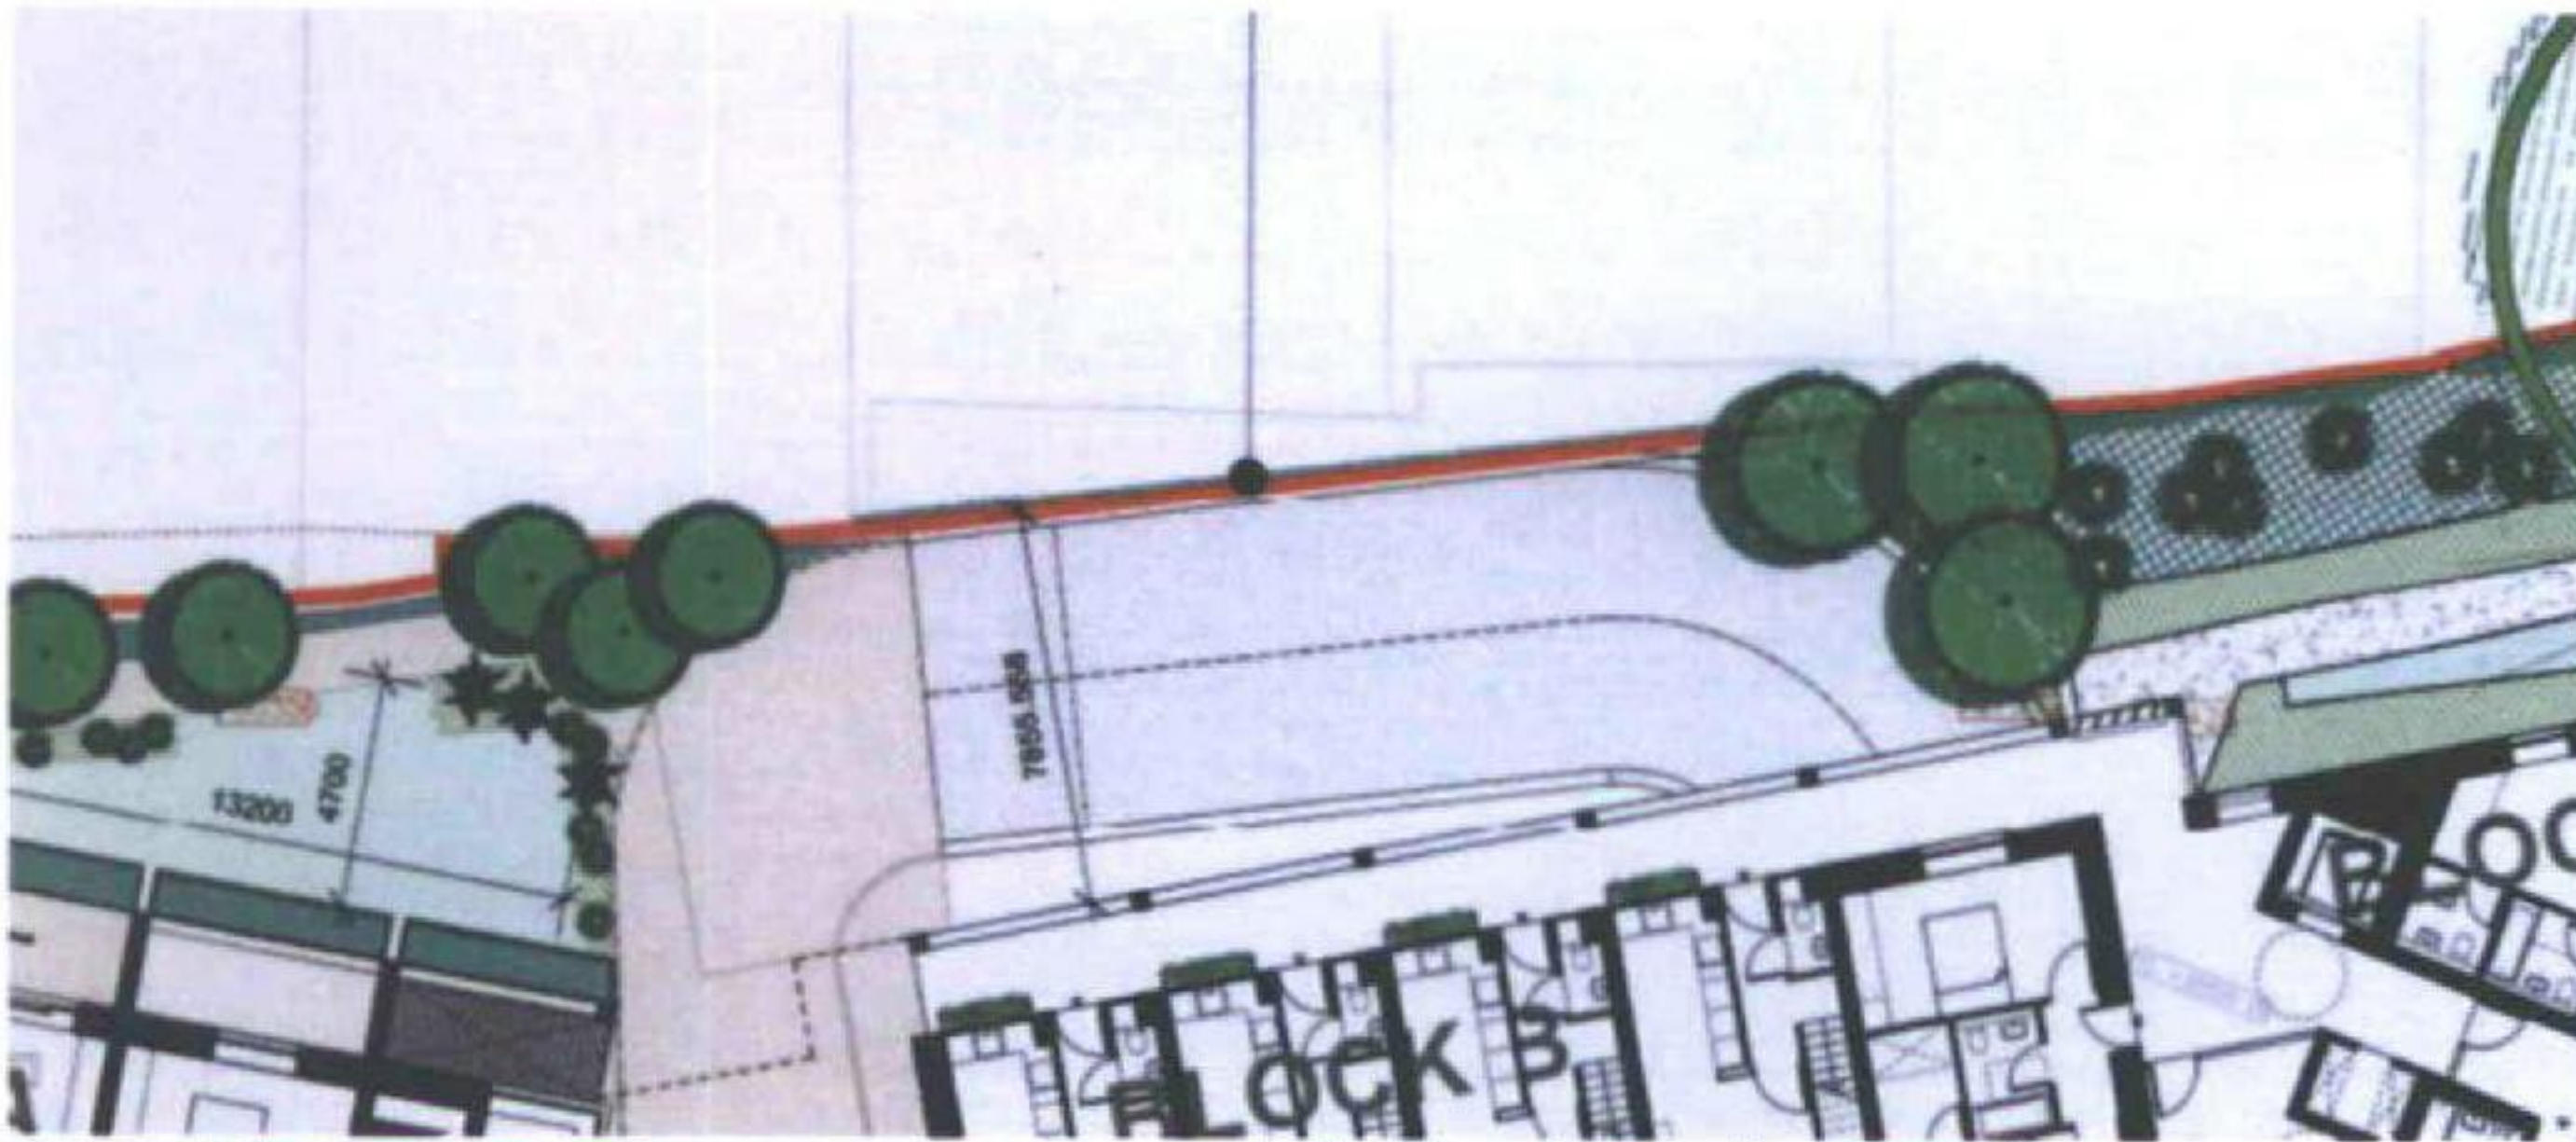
The car park entrance and access road sited hard up to the shared boundary
